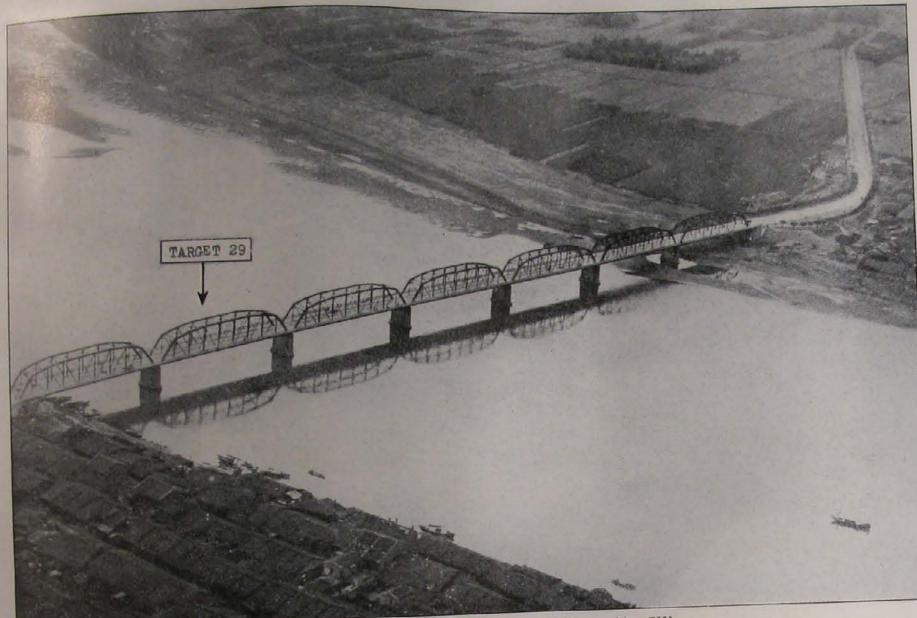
PHOTO I... TARGET 29 - Taihoku Highway Bridge looking SW.
